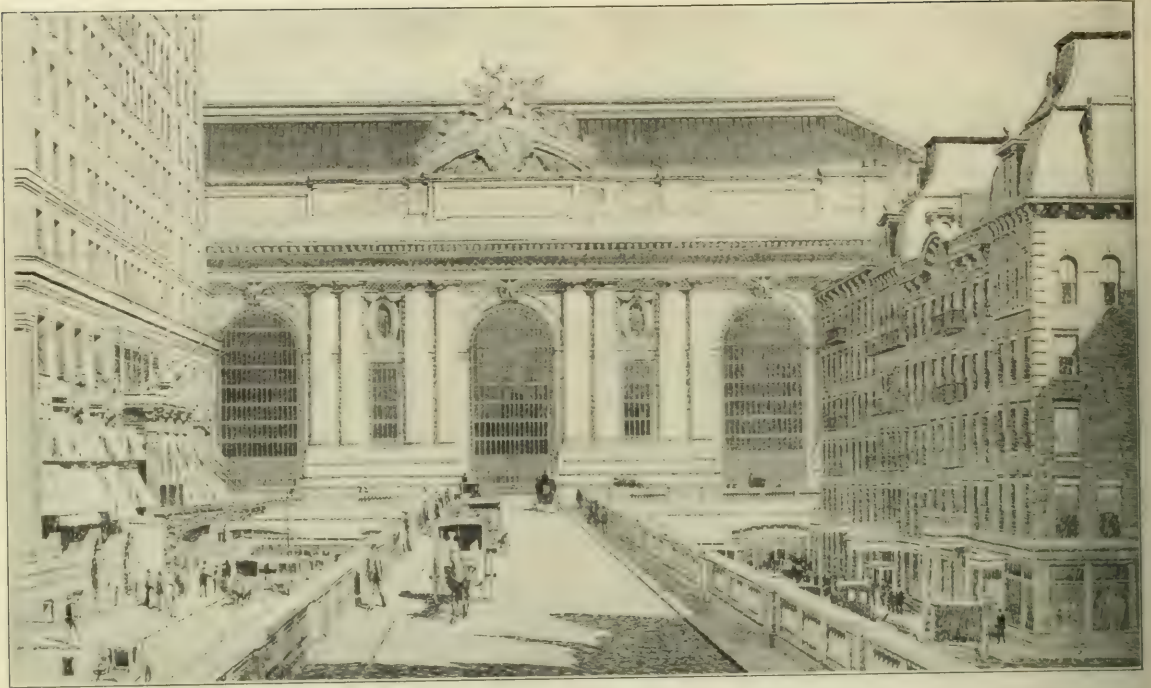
Grand Central Terminal, New York City. Proposed Main (South) Approach to New Station.
